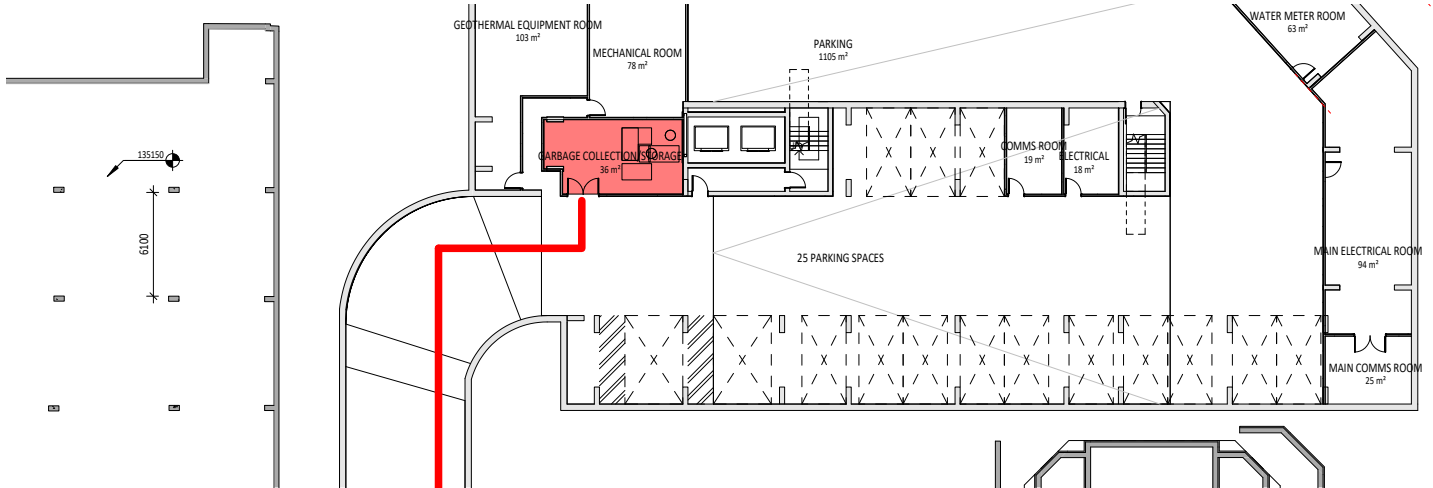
Garbage collection storage in the Lower level 1 of Building 1
